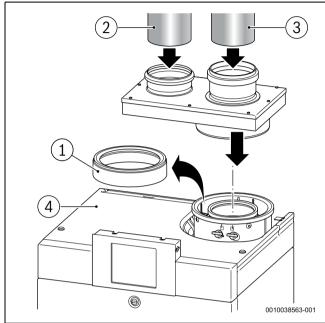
Mount the flue gas discharge adapter Ø 110-110
